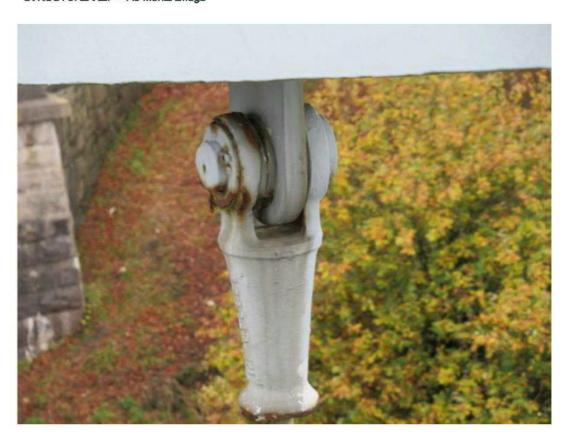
Tie bar — paint loss and minor corrosion to upper hanger connection to 19th hanger on the south west back-stay chains. Structurally, in good condition.
